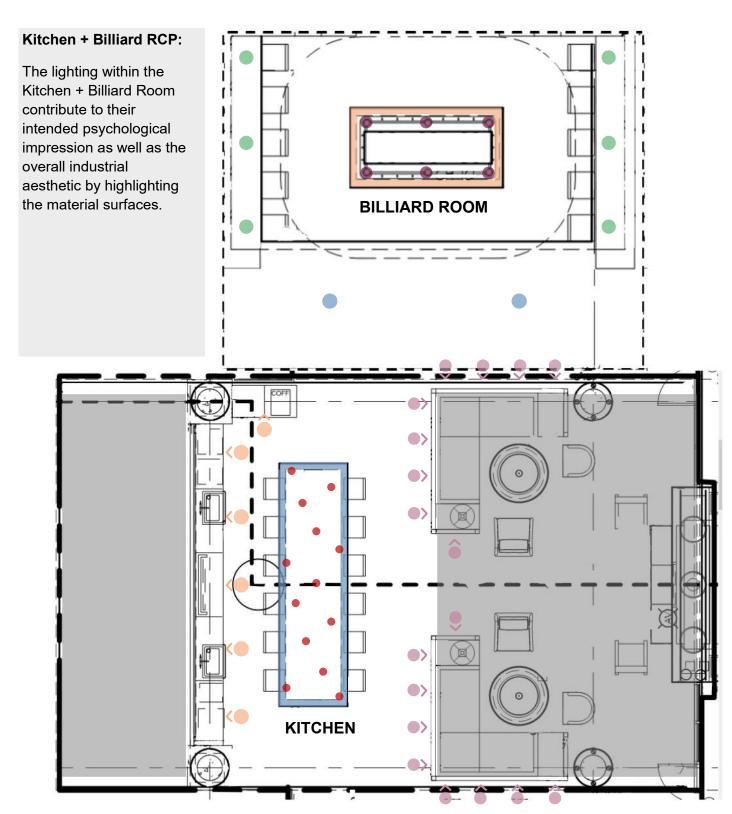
| Lighting Layout - Kitchen + Billiard Room
